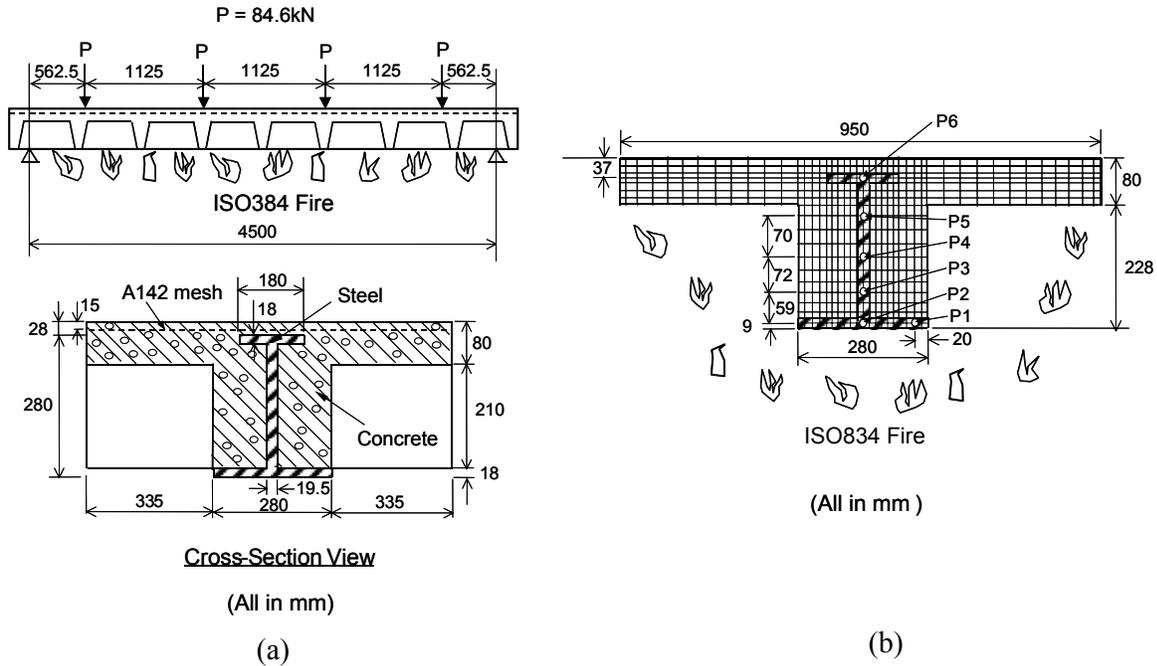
A full-scale ISO384 standard fire test on a “Slimflor” beam: (a) Details of the Slimflor beam tested; (b) The element segmentation mesh adopted.
